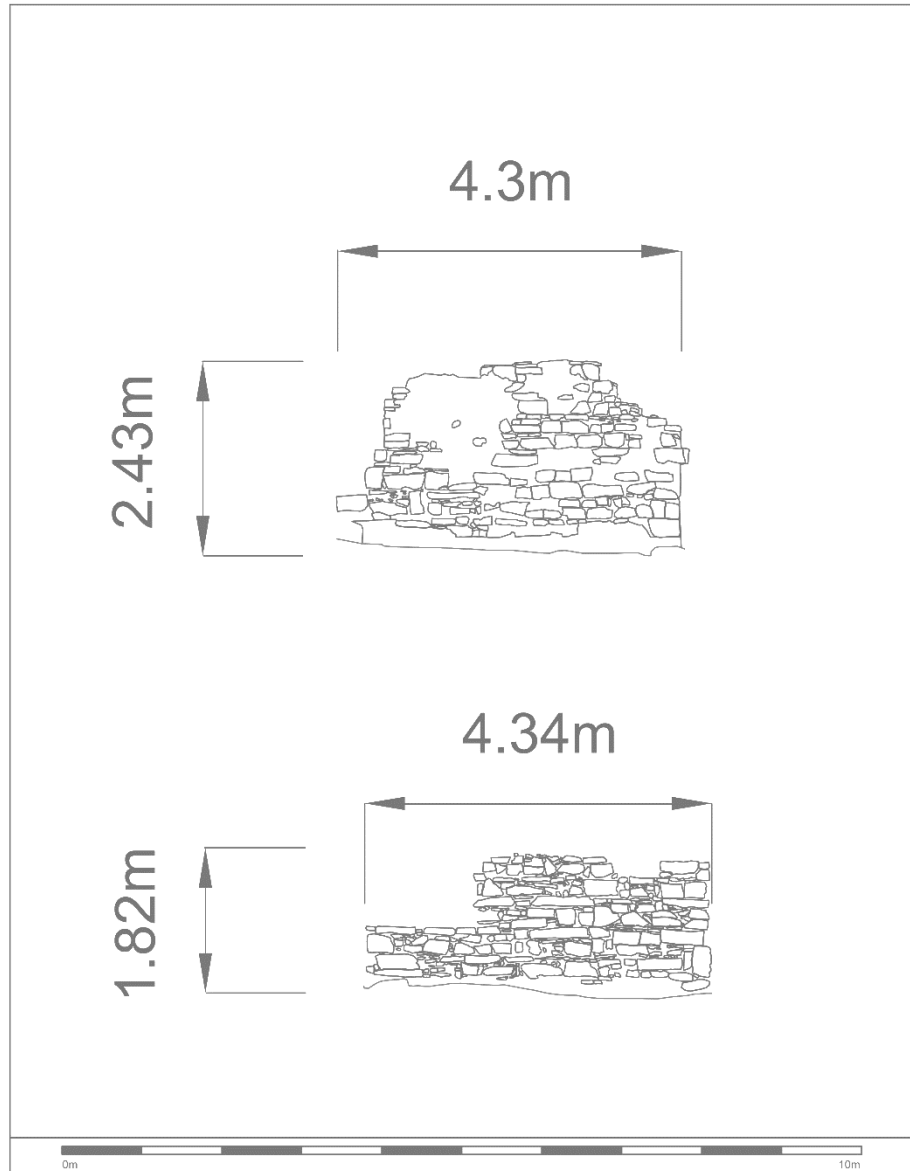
The north-west (top) and north-east (bottom) internal elevations of the signal tower at Knocklane Hill Signal Station.
